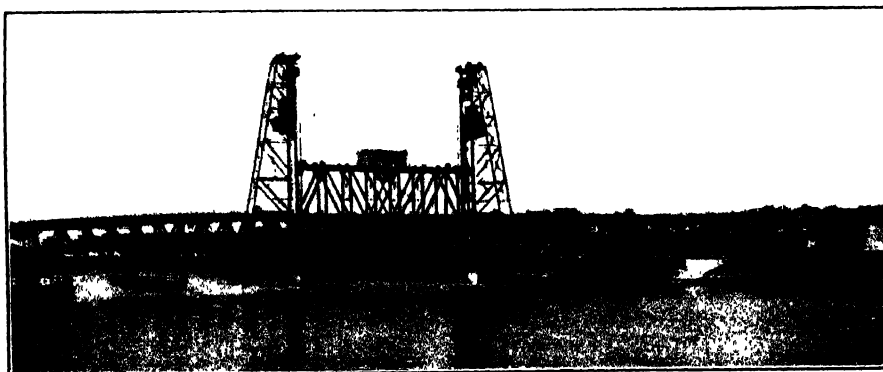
O.-W. R. R. and N. Co.'s Bridge over the Willamette River at Portland, Ore.—Lifting Deck Up.
